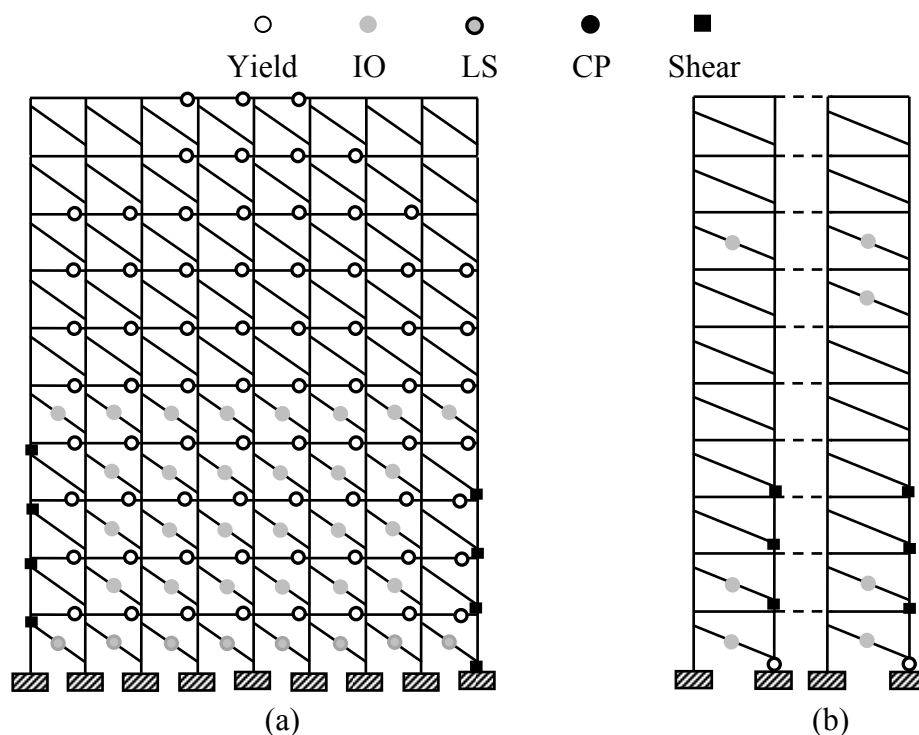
Collapse mechanism of ten storey RC frame building with URM infills, designed for gravity loads only as per relevant Indian Standards: (a) typical longitudinal frame; (b) typical transverse frame.
